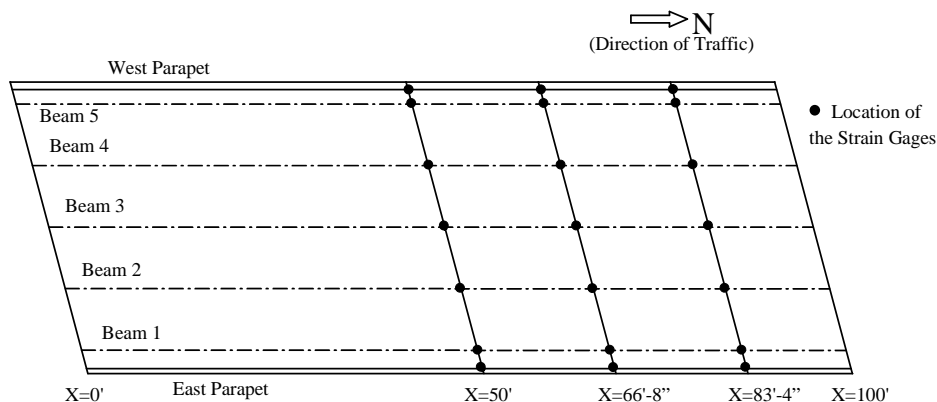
Instrumentation Layout Used in Test Series 1 and 2, Slaughter Creek Bridge
